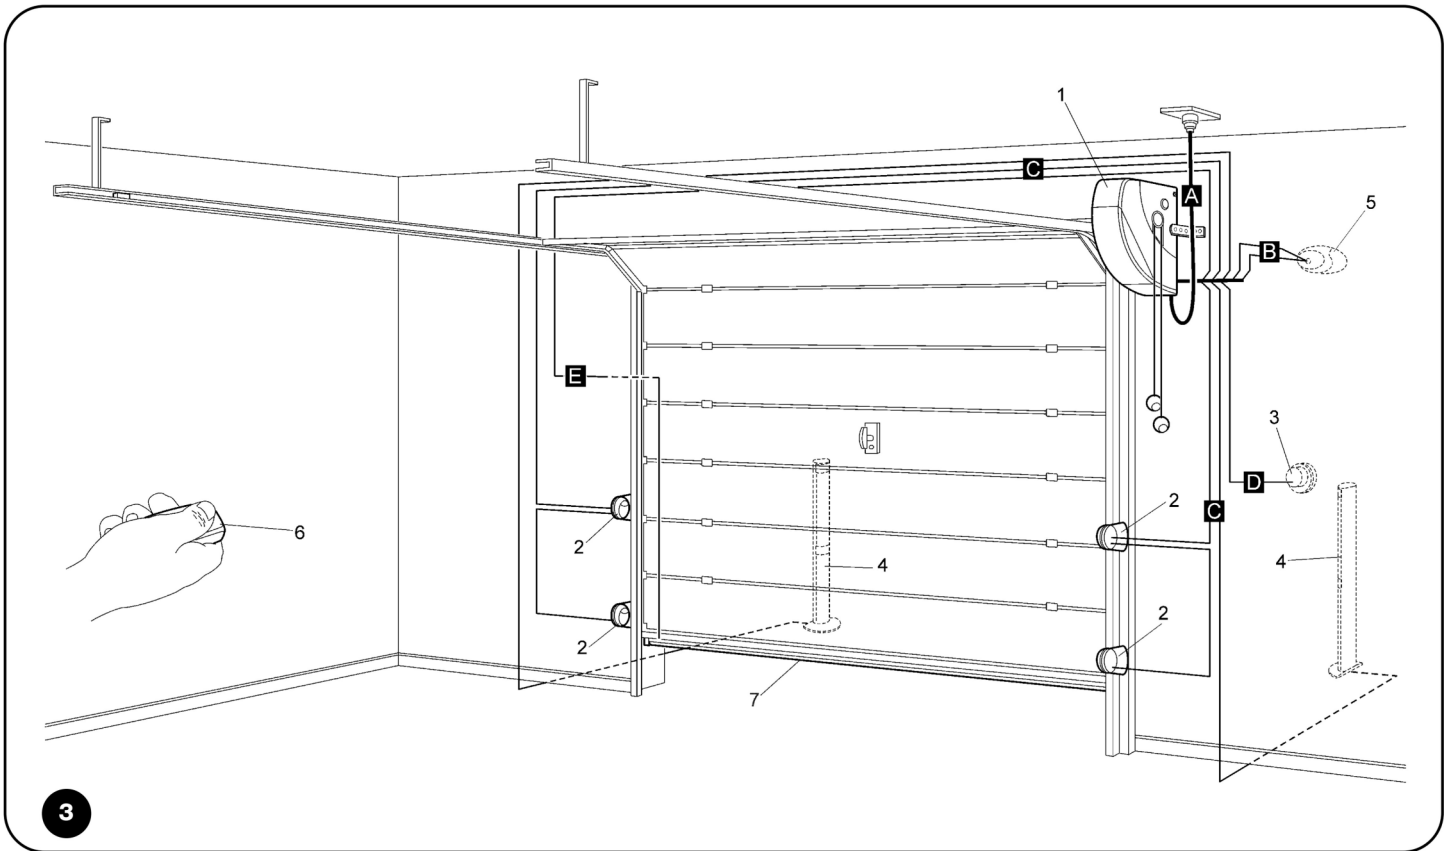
illustrates the complete installation of a Soon gearmotor. The drawing shows the various components and cables required for connection, all assembled and positioned according to a standard layout.
